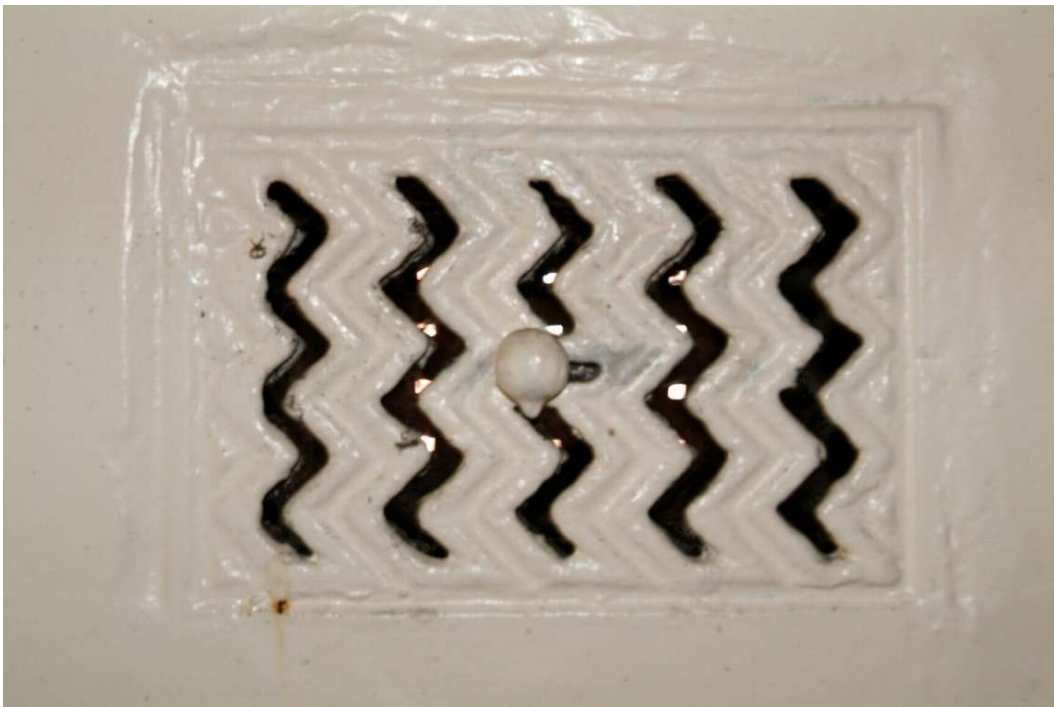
Building 30 (GF): northeast principal room showing vent in rear of wardrobe, view to the south
